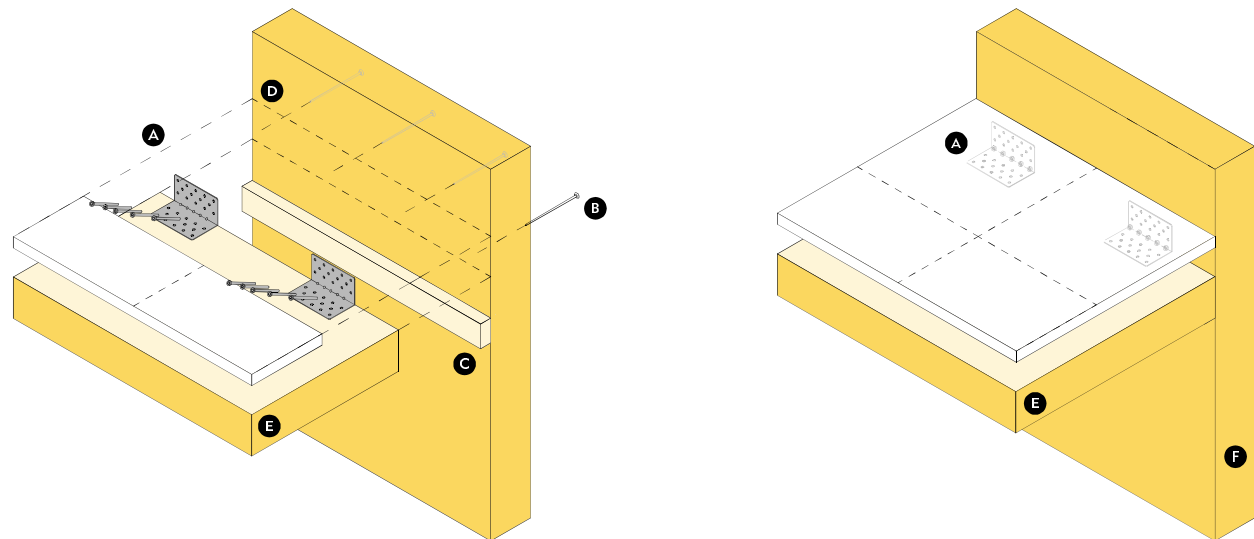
FLOOR PANEL TO CORE CONNECTION
